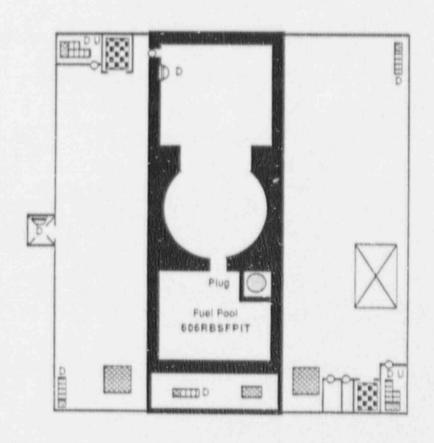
WNP-2 Reactor Building, Elevation 548' 0"
